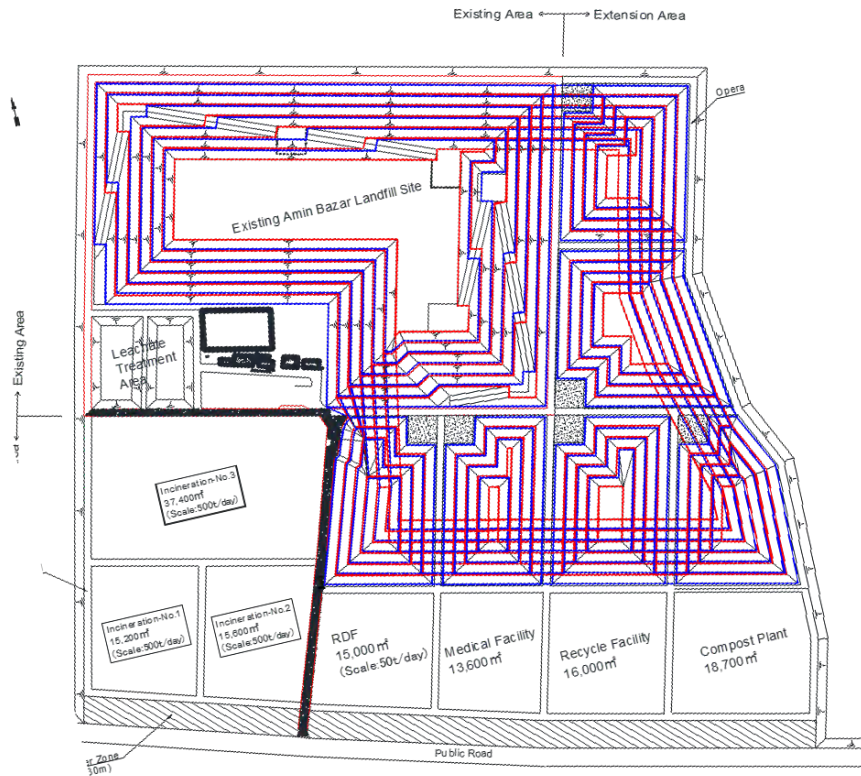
Proposed Final Layout of Extension Area (Height of 30 m)
